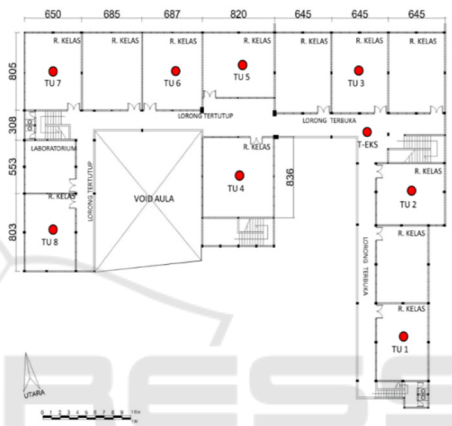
Location of Thermal Measurement Points 2nd Floor and 3rd Floor Classroom Building
